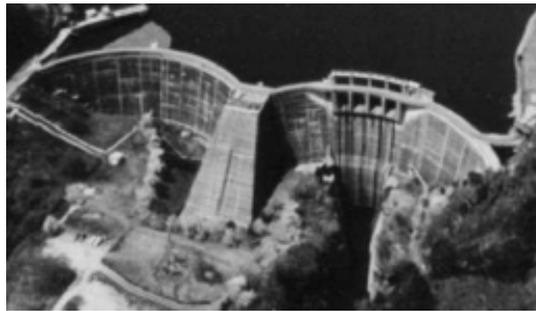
Existing multiple arch dam (Construction case of double arch dam)
